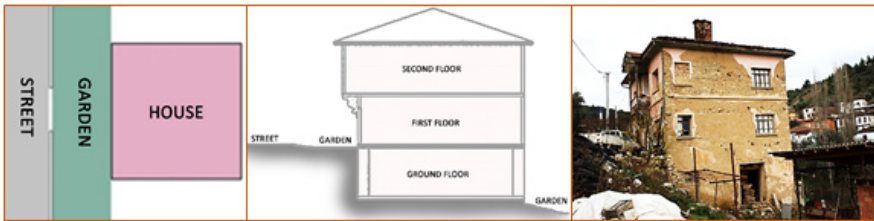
Entrance to the garden and house from the street; plan, section and view
